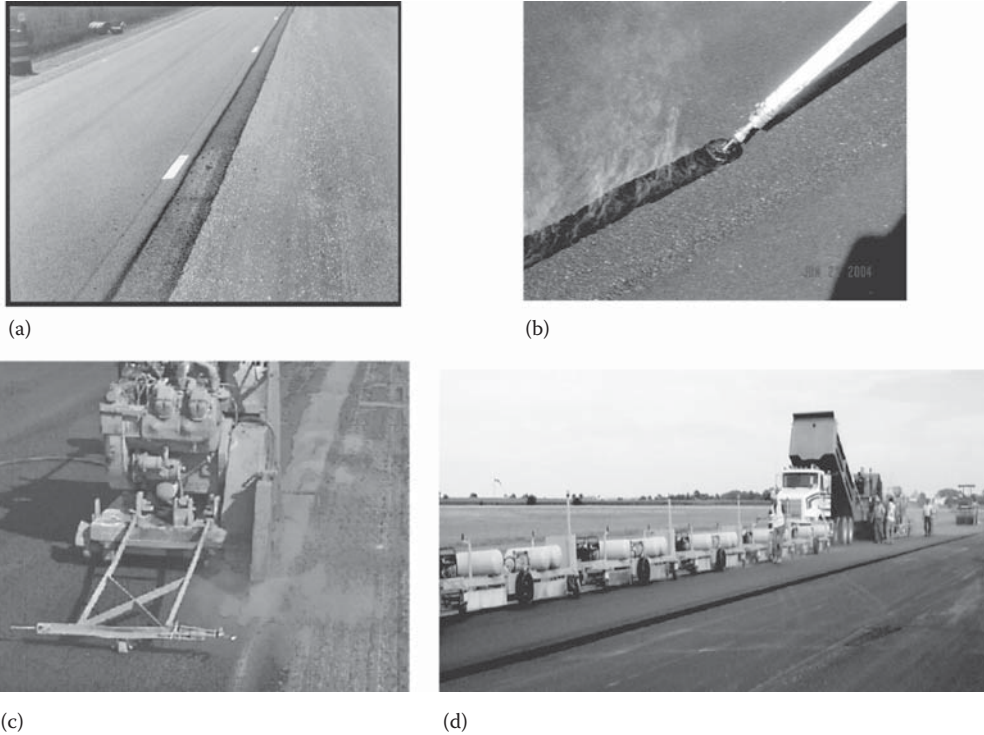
Different longitudinal joint construction techniques. (a) Notched wedge joint. (b) Application of rubberized asphalt tack coat at joint. (c) Joint cutting. (d) Infrared heating of joints. (Courtesy of Prithvi S. Kandhal, the U.S. Air Force, Arlington, VA; Tom Allen, Ray-Tech Infrared Corp., Charlestown, NH.)
